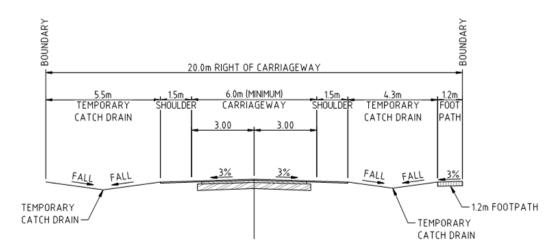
Proposed Road 21 Connecting Cummins Road and the Site.
